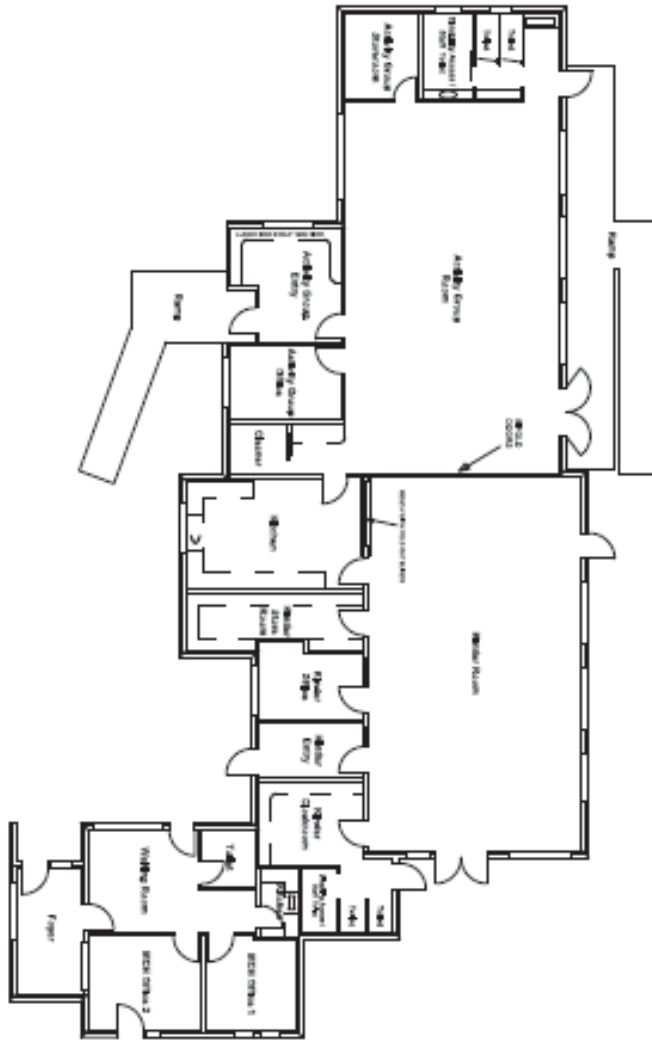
Floor plan of the Ballan & District Kindergarten site
